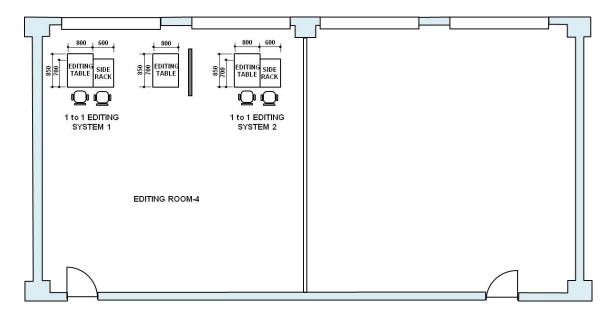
Equipment Arrangement of Editing Room-4
